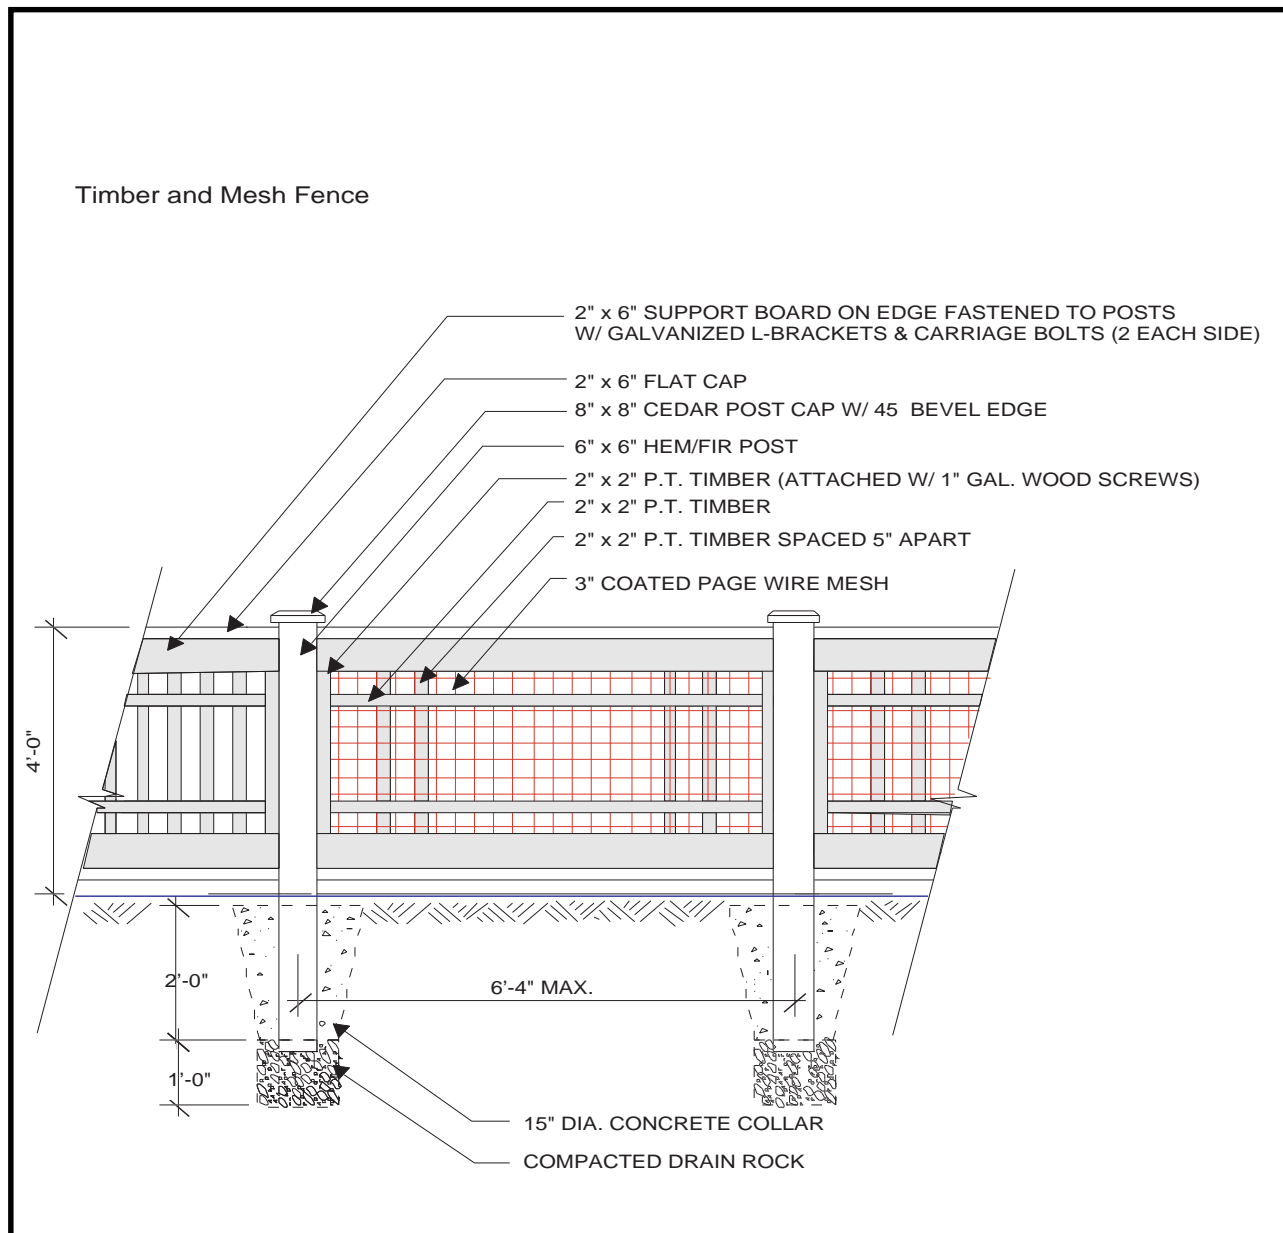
Detail of Timber Rail and Mesh Fence (Page Wire)
